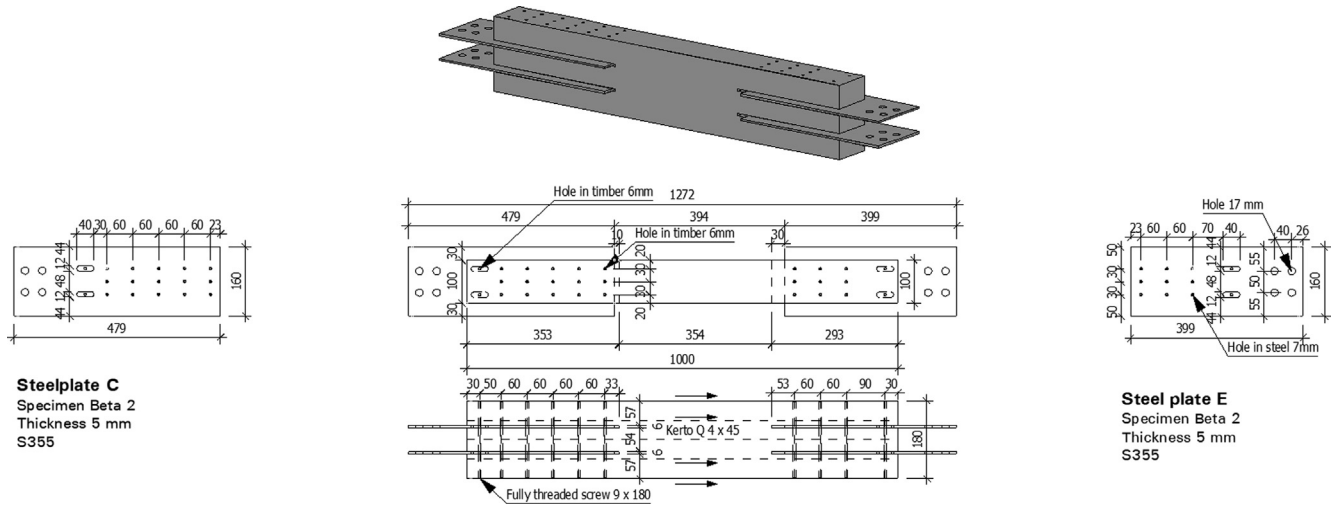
Layout of specimens Beta 2, specimens ID: B.4, B.5, B.6 (LVL with confinement using fully threaded screws, fixing connection left, tested connection right).
